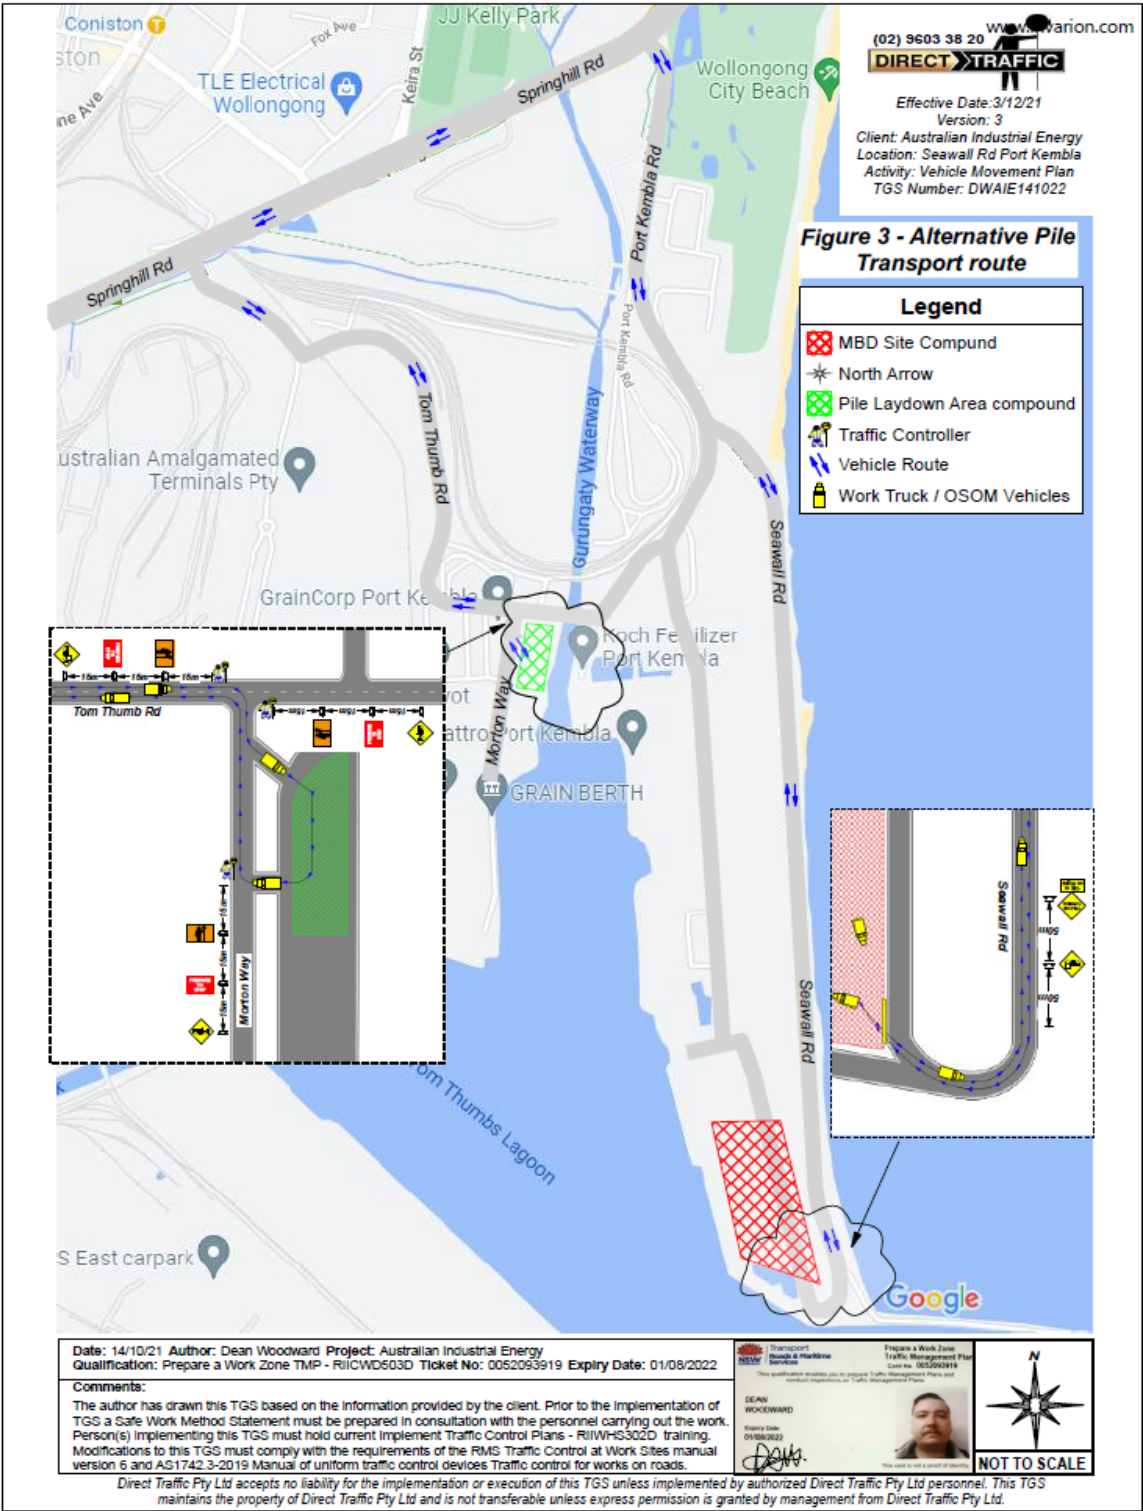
Emplacement Cell Construction Site and Pile Storage access
